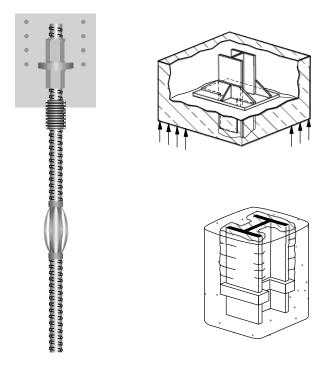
Anchor piles for concrete base slabs: GEWI-pile (left) and RI-pile, head (top right) and tip (bottom right)
